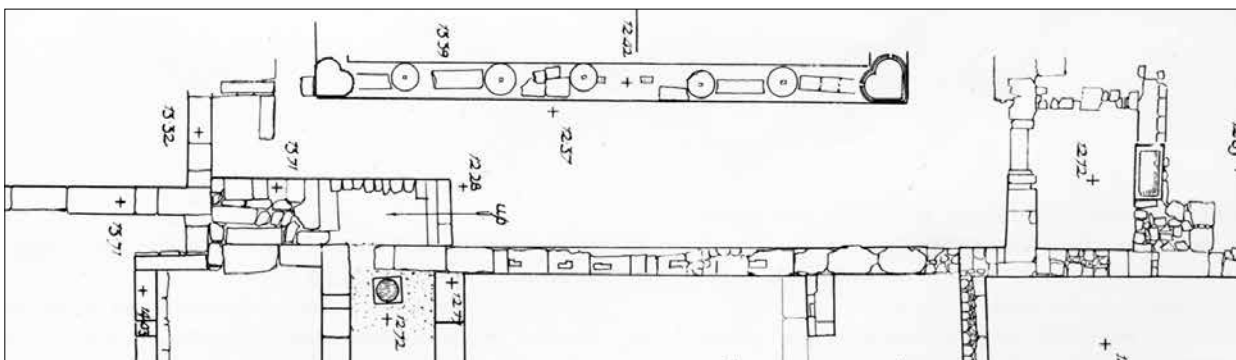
b. *Ptolemais*, House of Paulus, northern side: detail of the plan (after Kraeling 1962, plan XVI).
